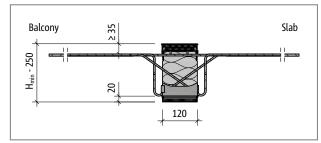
Schöck Isokorb® XT type K-M5-VV1: Product section
